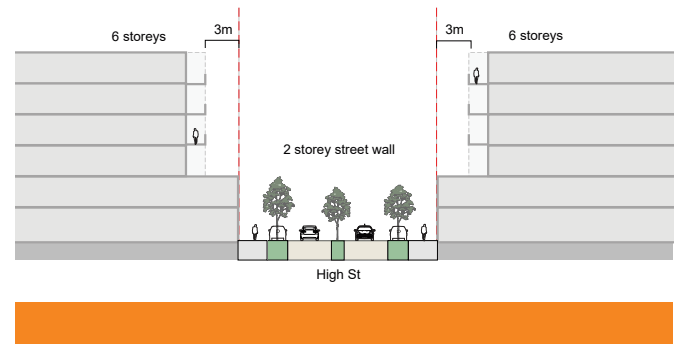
High Street, High Street Precinct. A two-storey street wall height is proposed, consistent with the existing character.
